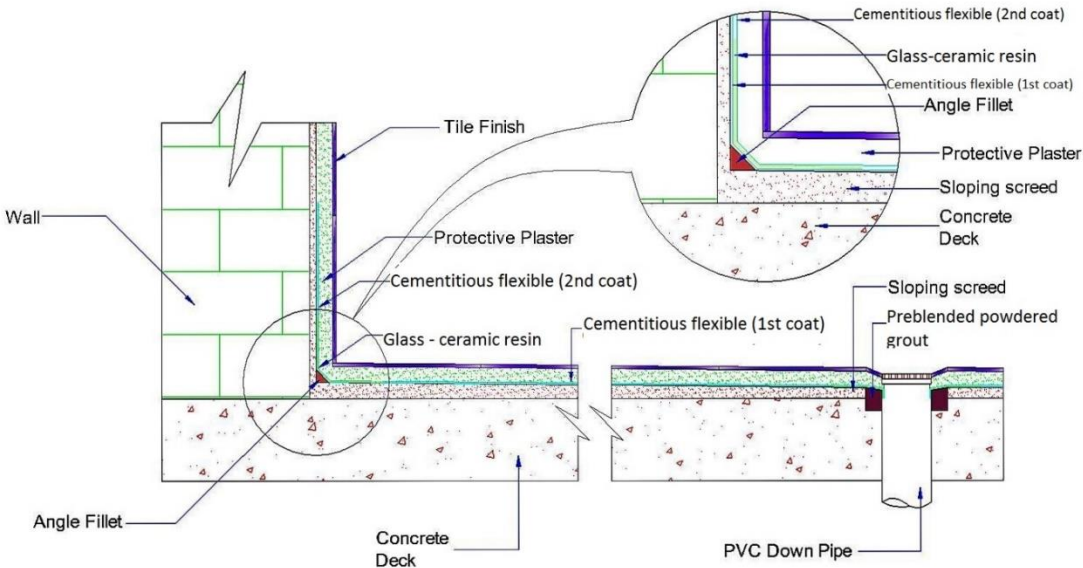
Waterproofing of Bathrooms and Toilets (Single Layer System)
